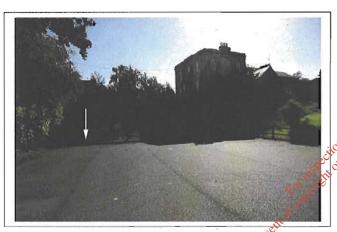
Proposed location for major pumping station at Monkstown, from east
